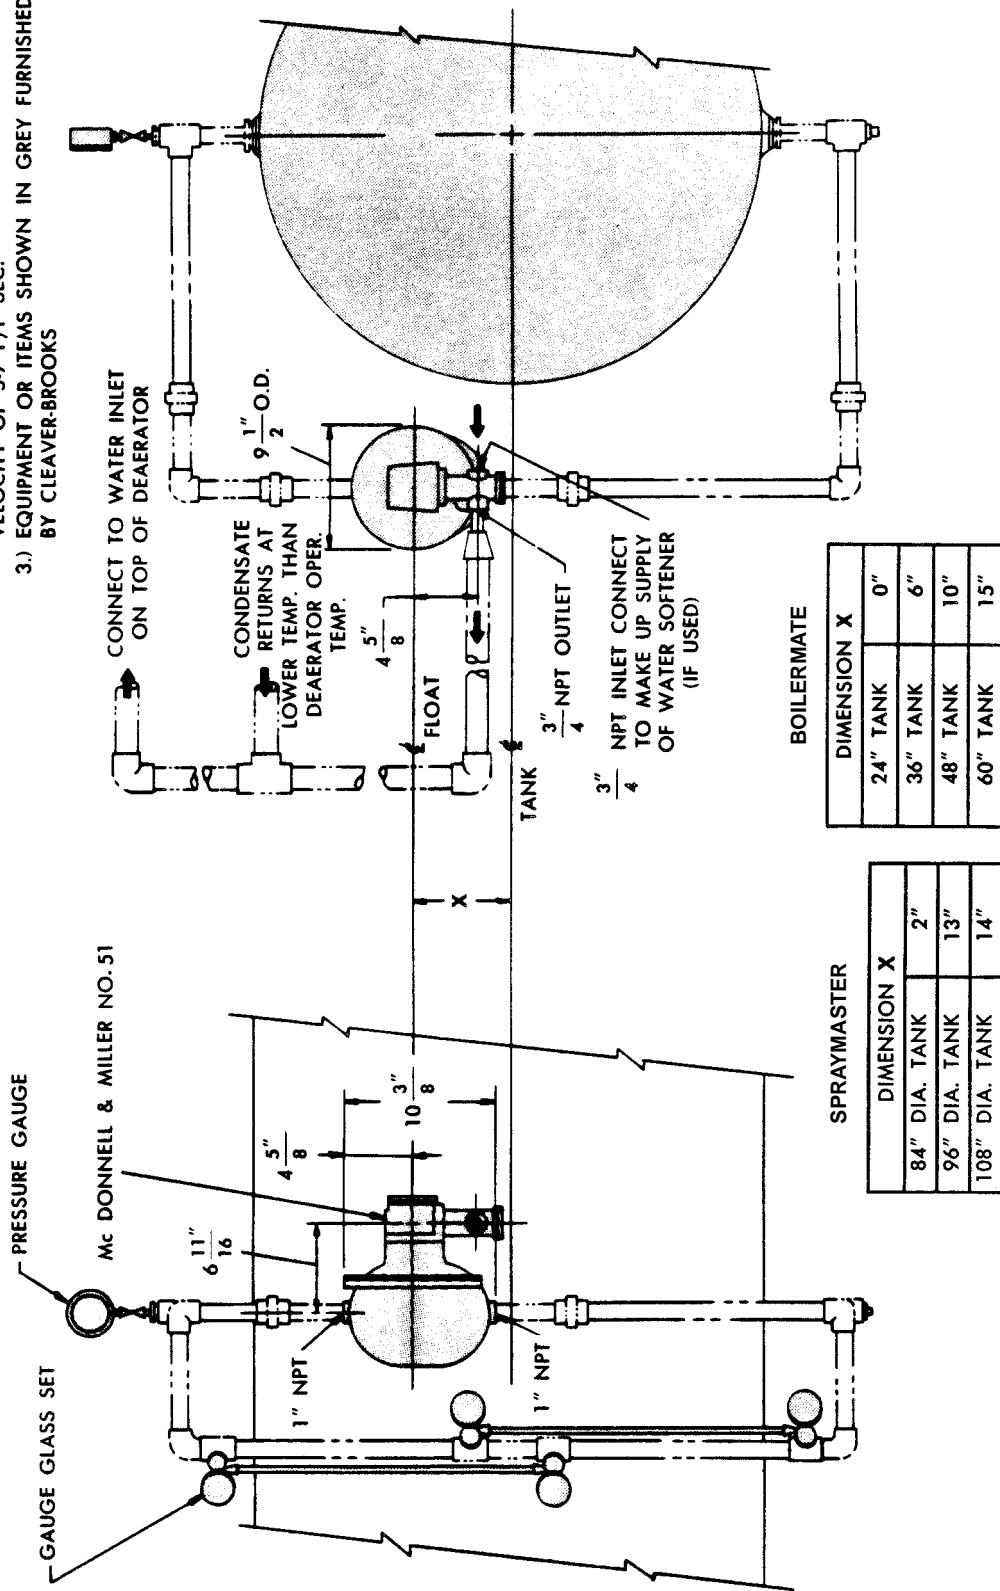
Make-Up Valve Arrangement for Spraymaster or Boilermate Storage Tanks (McDonnell & Miller No. 51)
